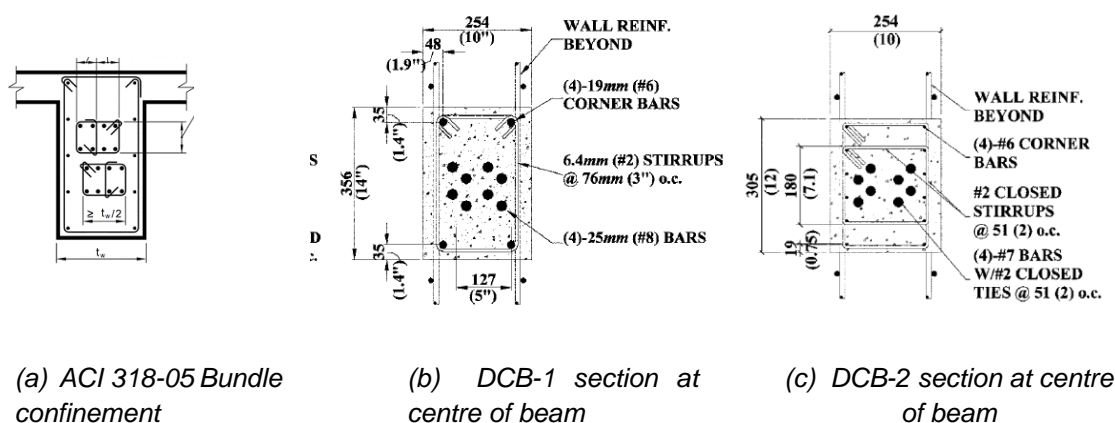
Test specimen sections showing stirrup arrangement (Fortney et al. 2008)
